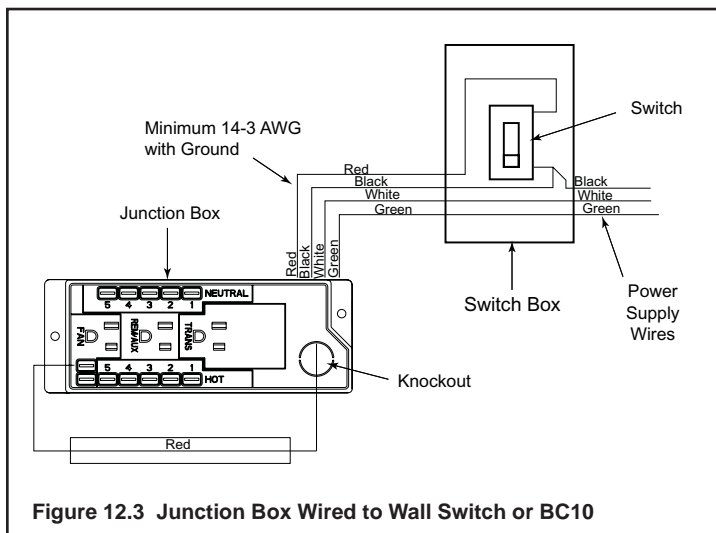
Junction Box Wired to Wall Switch or BC10
